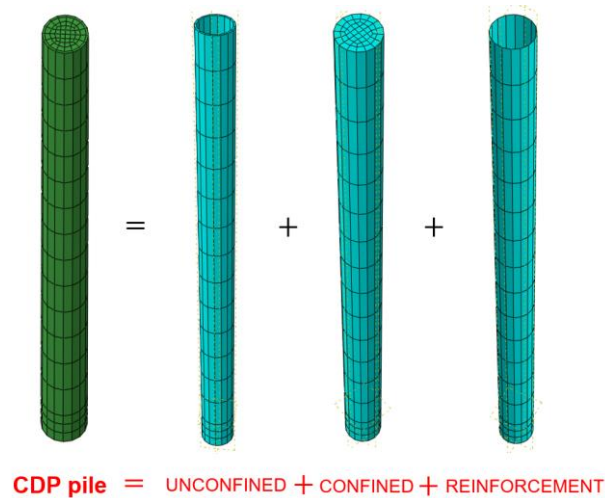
three components of concrete damaged plasticity (CDP) pile
